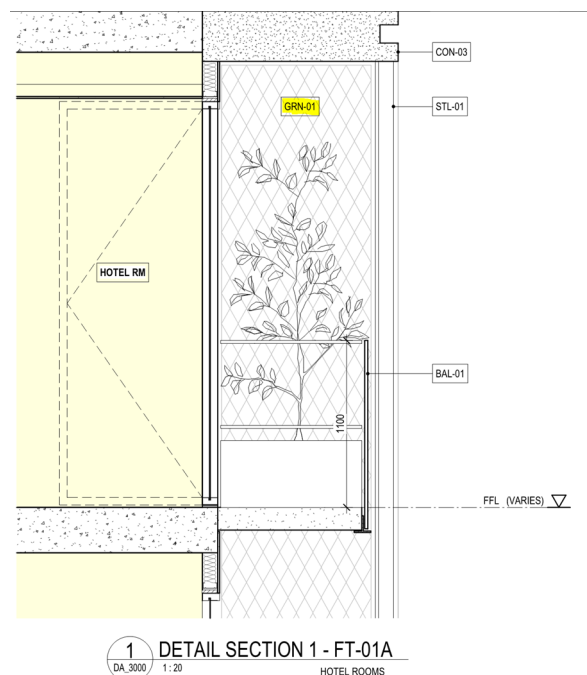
(Left) – Proposed Green Wall System (Hassell, Design Report)
